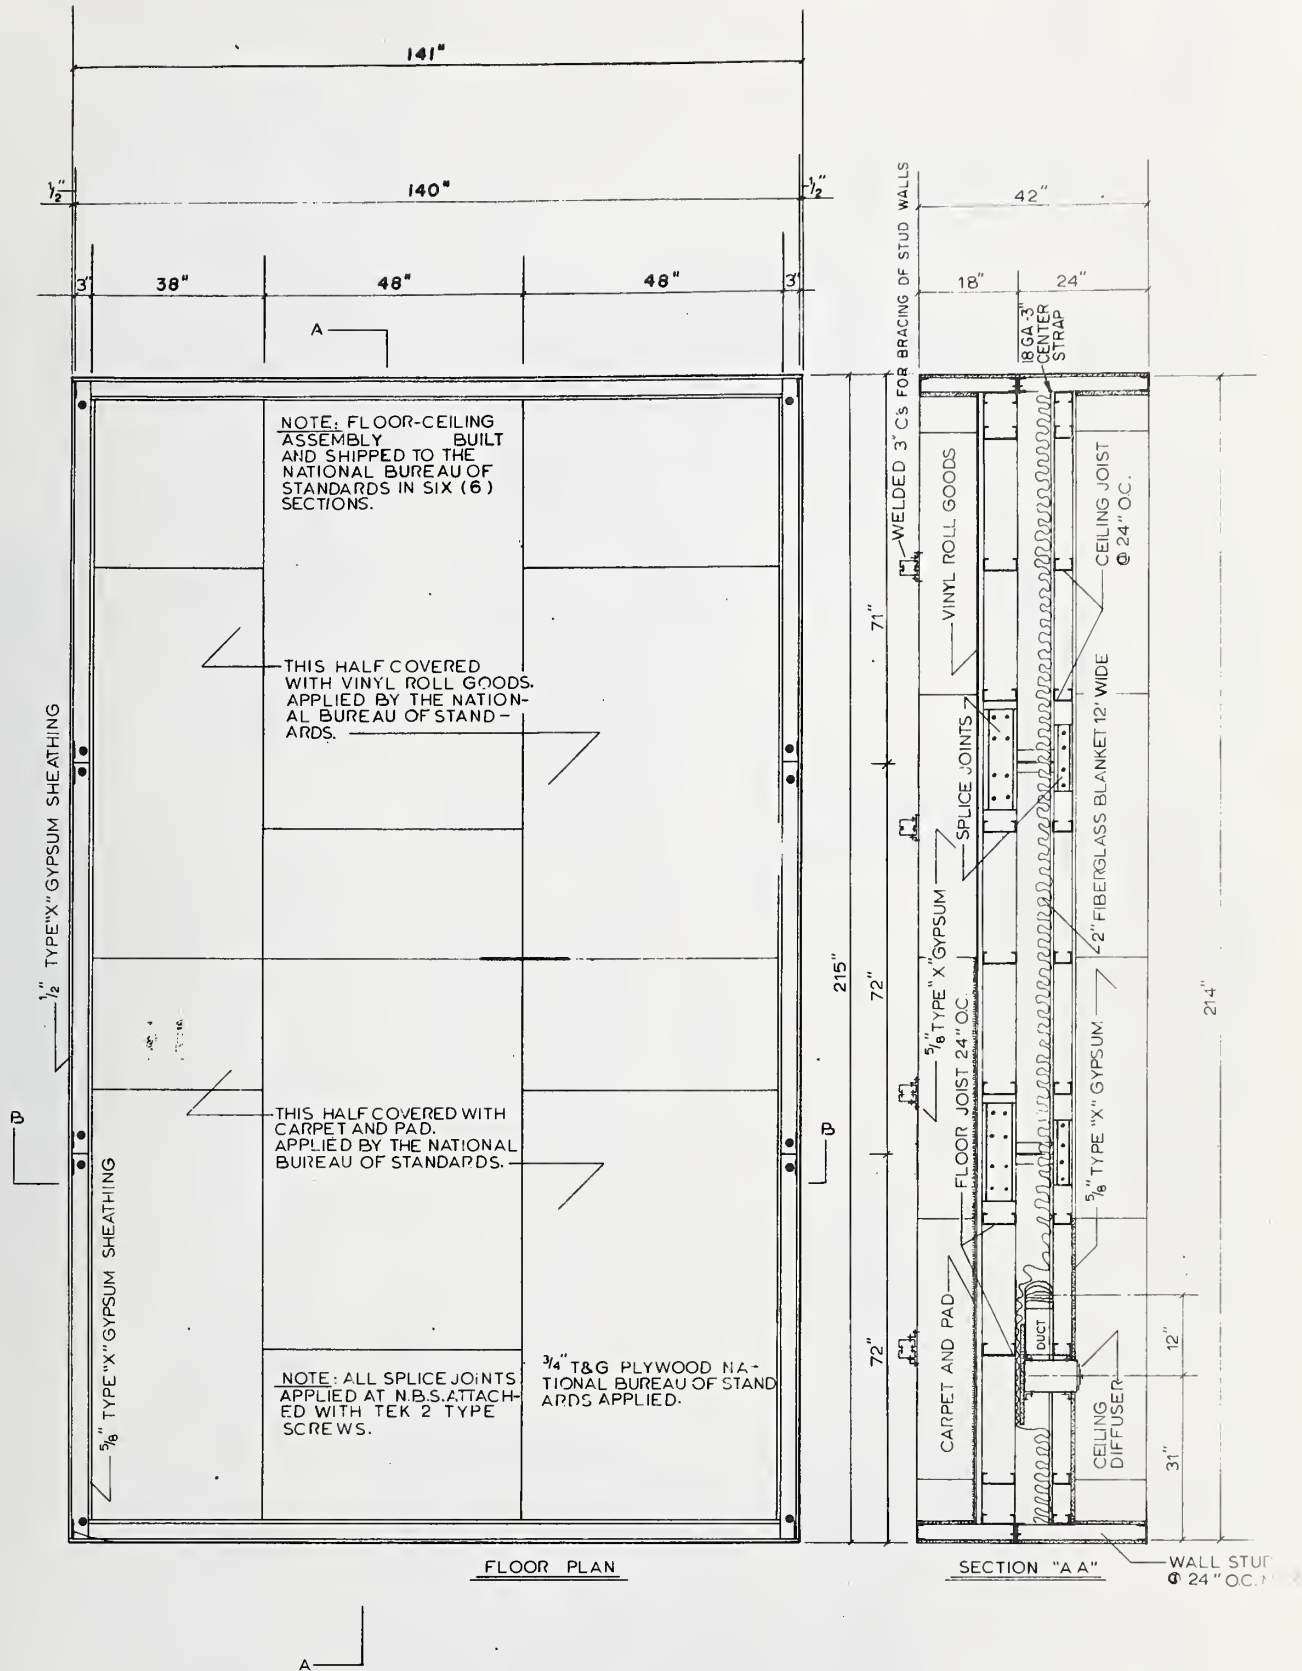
FLOOR-CEILING ASSEMBLY CONSTRUCTION
